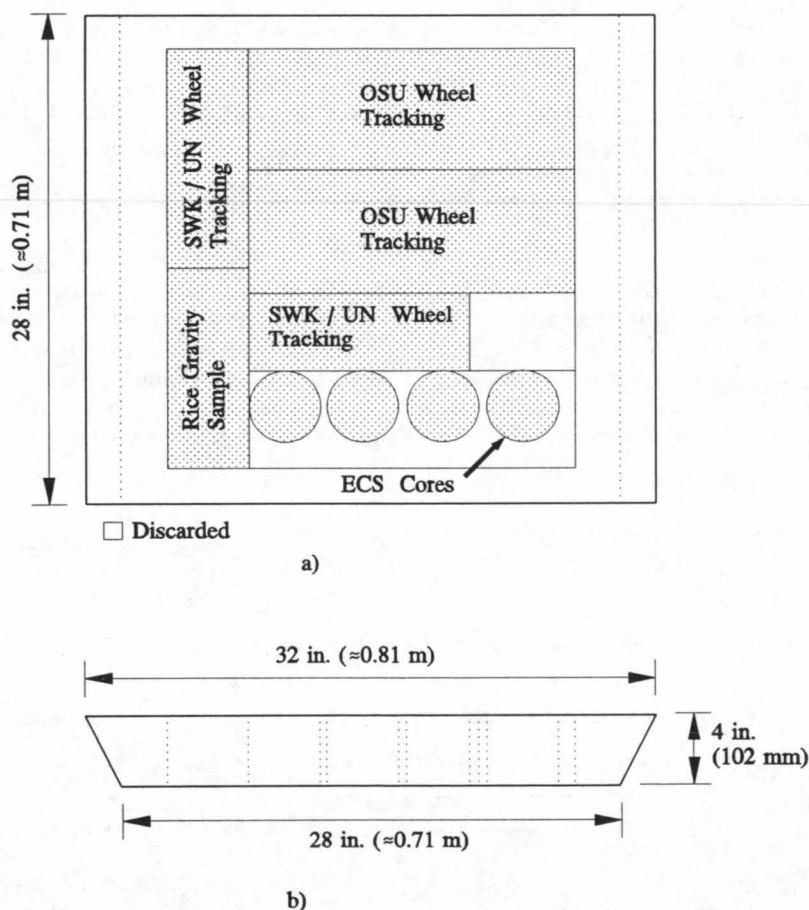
Layout of specimens cut from slab: (a) plan view, (b) elevation view.
